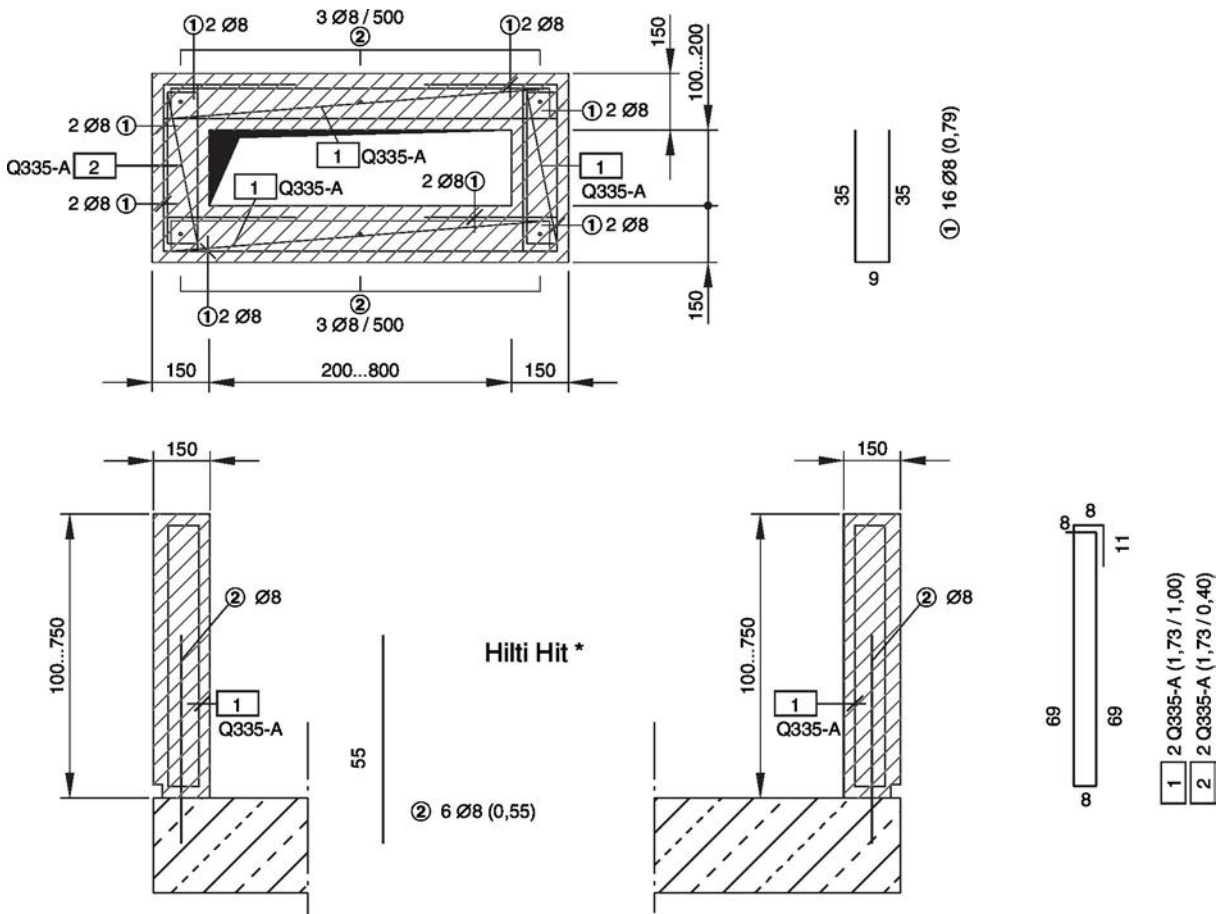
Reinforcement plan for concrete bases with a height of 100 to 750 mm
